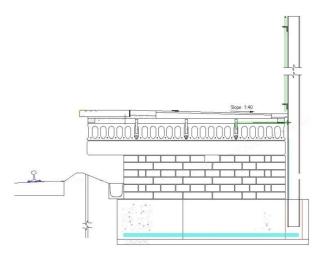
Cross-section of Network Rail standard design for a Type 1 Cross-fall platform
